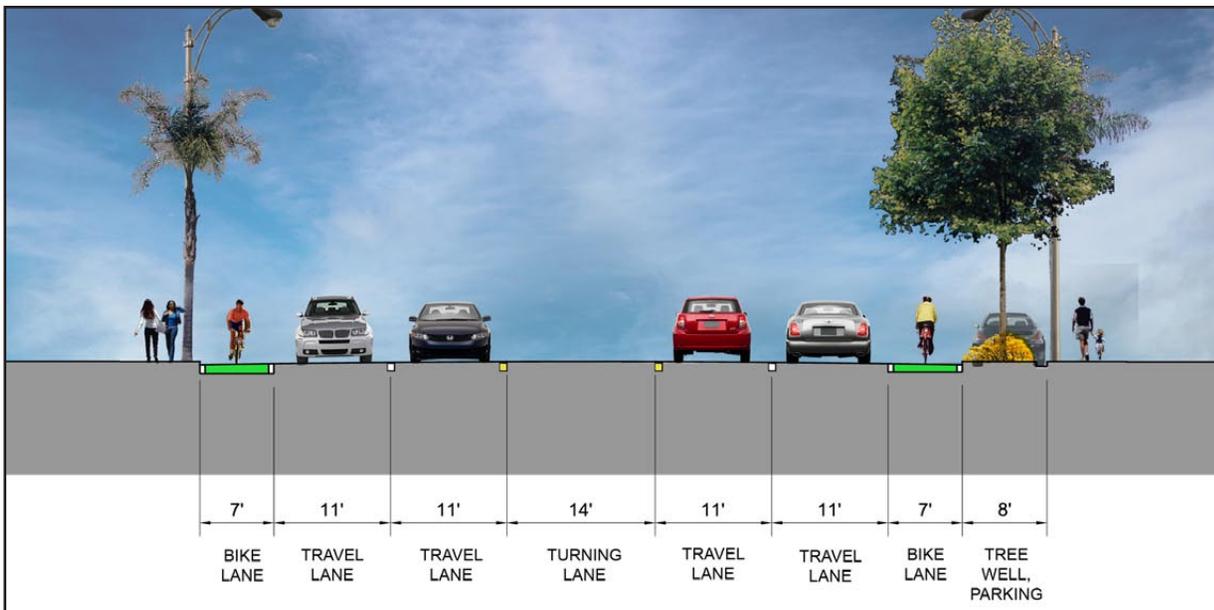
Peck Road, facing south, north of Durfee/Peck intersection — Proposed.
